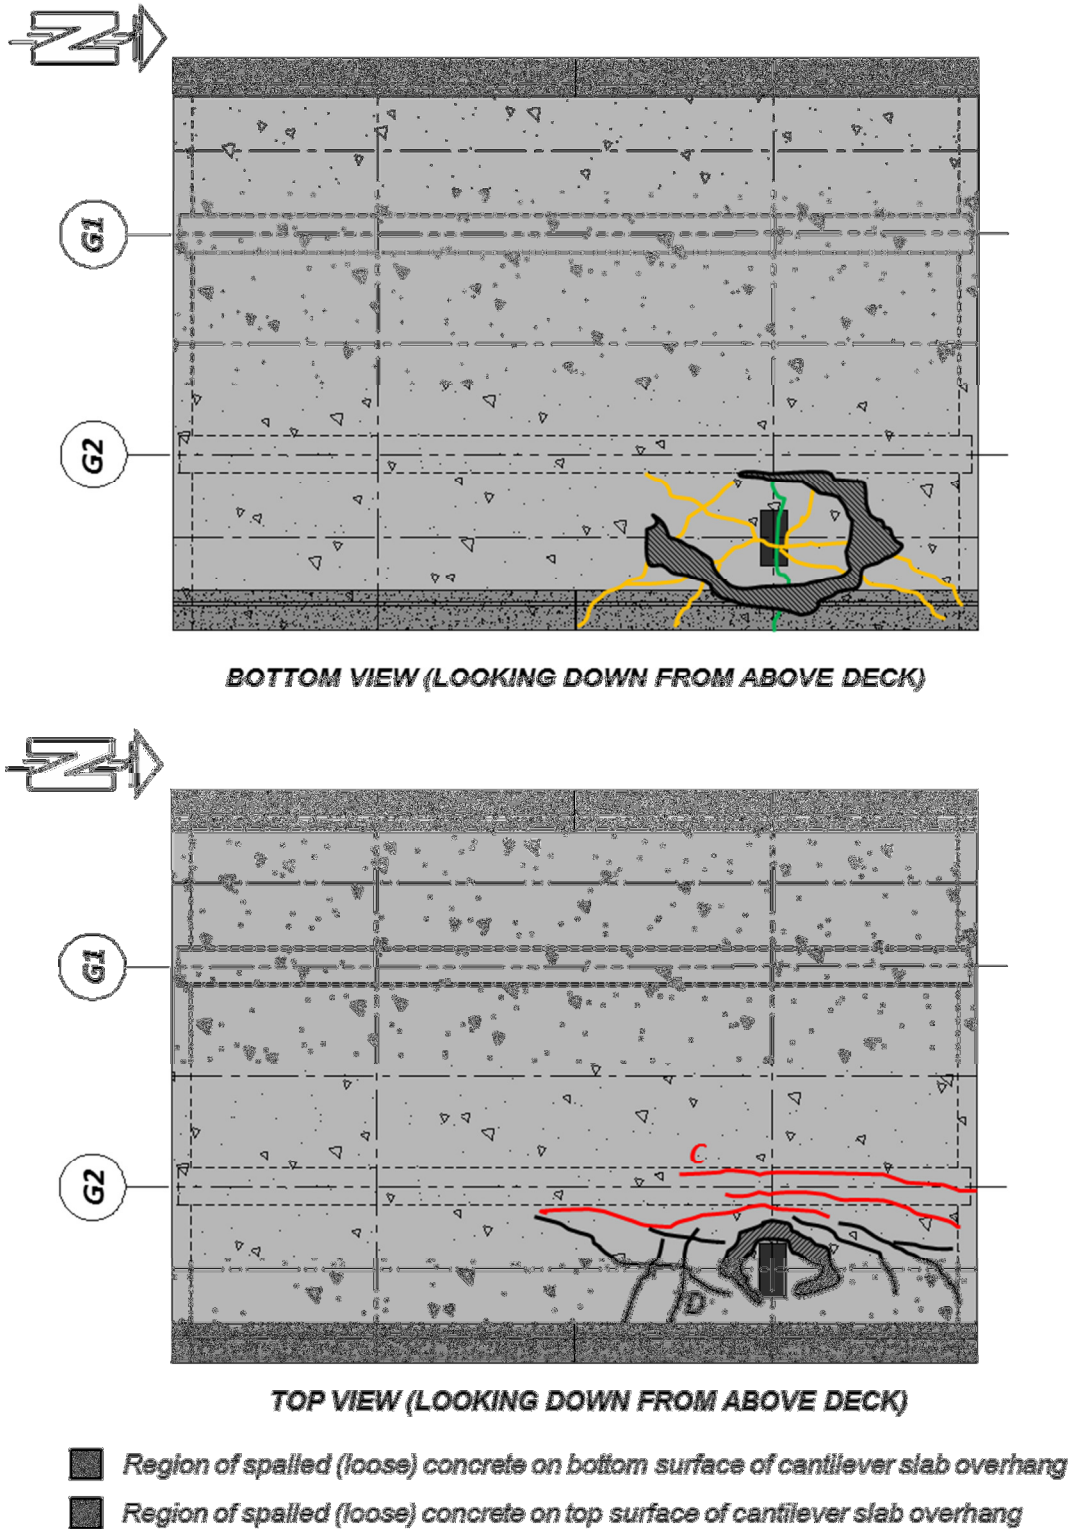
Crack patterns for the cantilever section with GFRP reinforcement subjected to fatigue cyclic loading
